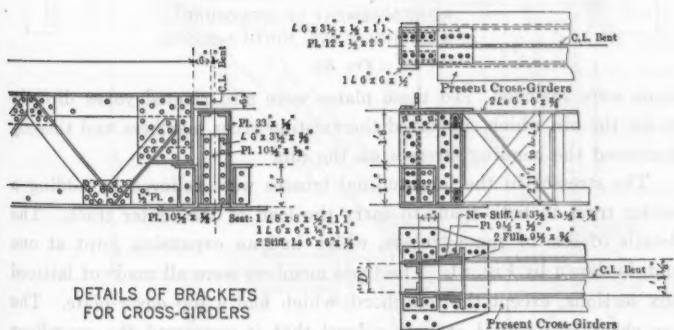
shows the details of the cross-girder extensions and the new track stringers. Two vertical plates were riveted to the flange angles of the twin girder, and extended beyond it the full width of the new seats. Two vertical diaphragms stiffened these plates, one at the cross-girder end and the other at the center of the seats. Angles were riveted to the top and the bottom of the vertical plates, and were connected to the top and bottom flanges of the cross-girder by horizontal splice-plates. Regular seats were provided on the vertical plates for the new track stringers. The track stringers were lattice girders, in order to conform to the existing stringers.
